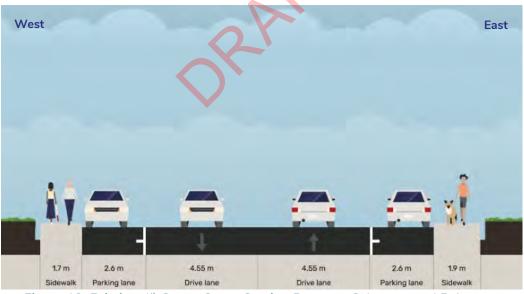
Existing 4<sup>th</sup> Street Cross-Section Between C Avenue and B Avenue
